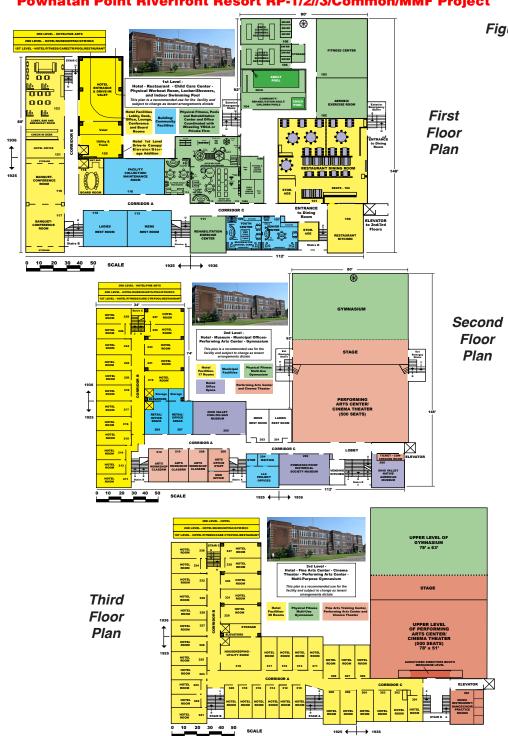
Powhatan Cultural Center RP-1 Project Facility Plan
